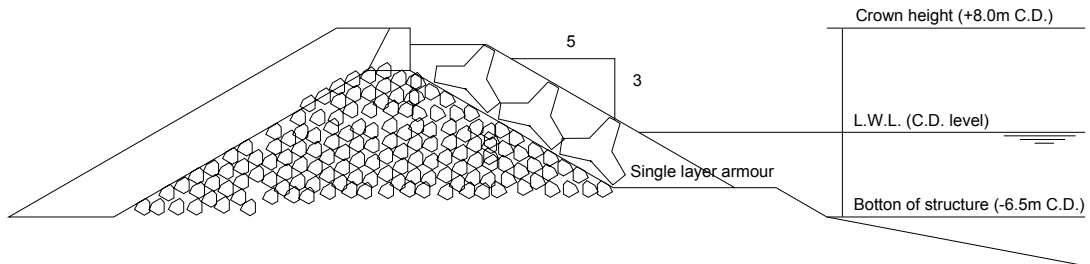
Cross section of a typical dike section in Suo-nada Bay
